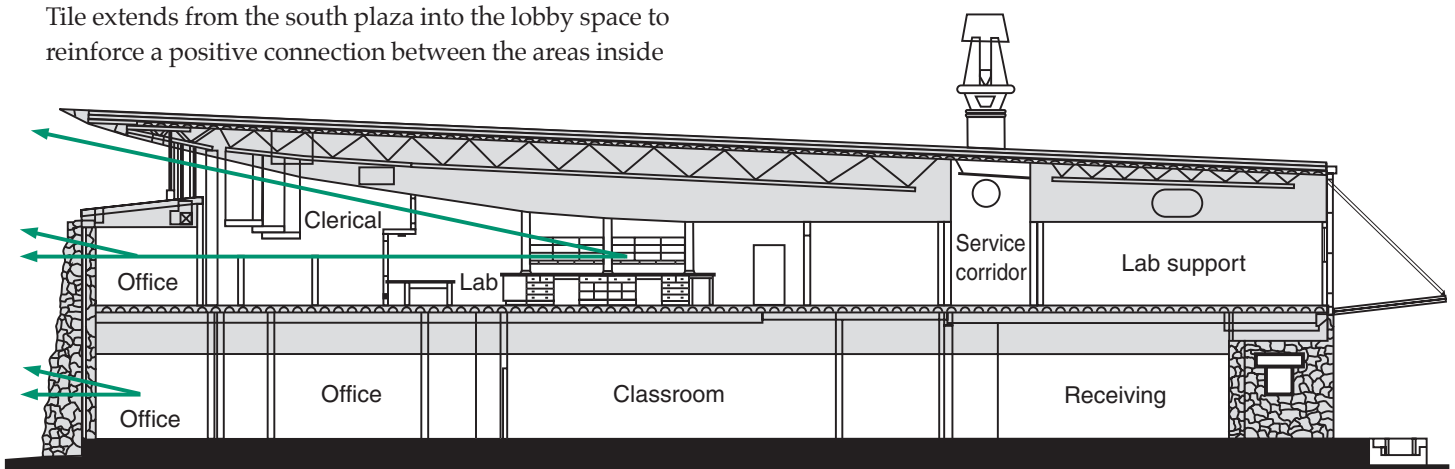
Building section, looking north (Courtesy of Lord, Aeck and Sargent).
